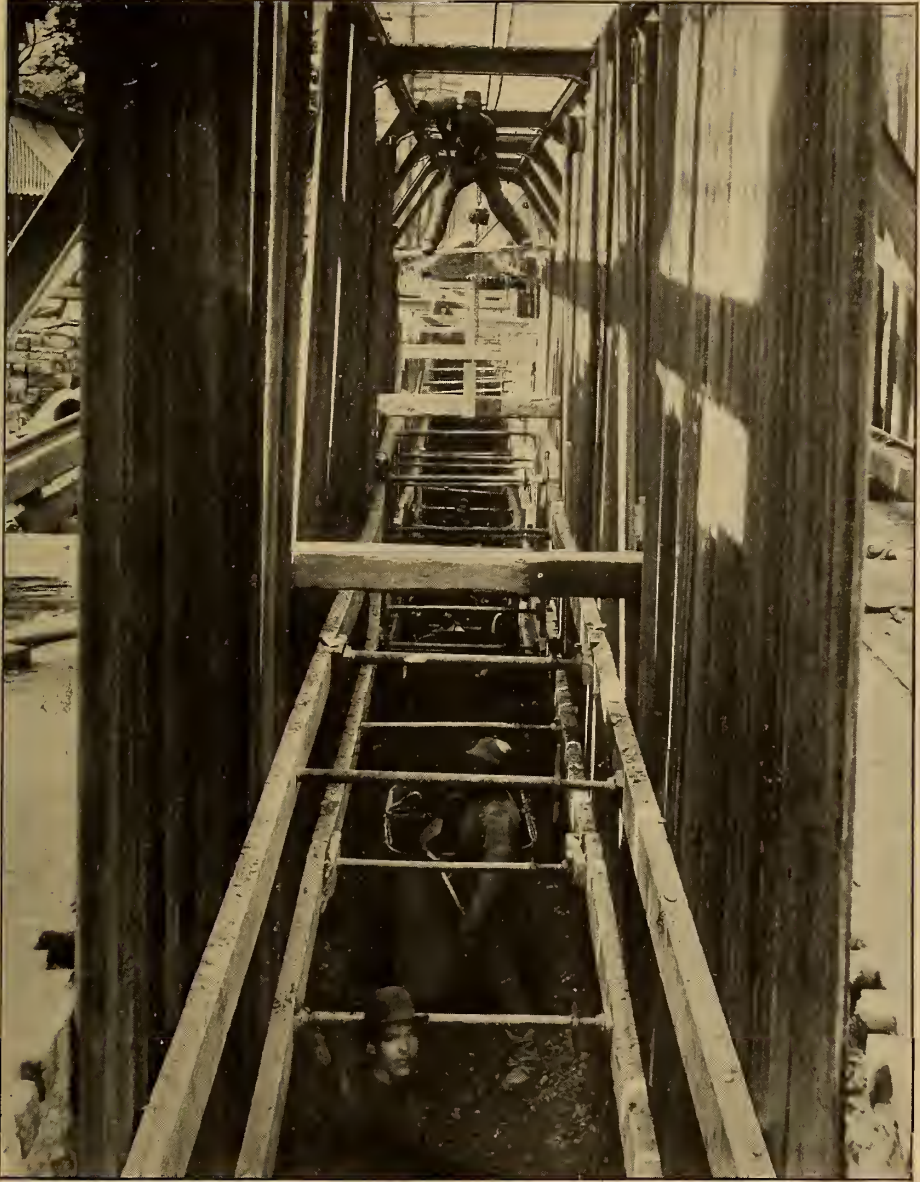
SEWER CONSTRUCTION AT WILKES-BARRE, PA., SHOWING  $\frac{1}{8}$ -INCH STEEL SHEETING, 10 TO 15 FEET LONG, DRIVEN BY HAND OR STEAM HAMMER. WEMLINGER STEEL PILING COMPANY, NEW YORK.
